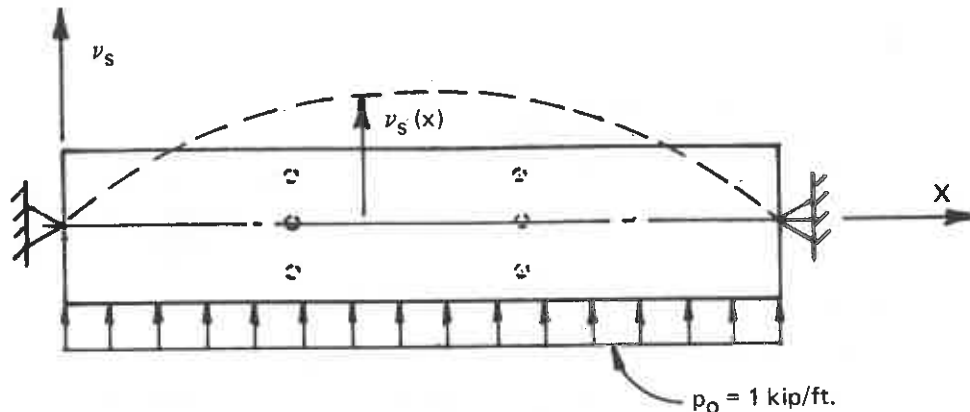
Plan view of three span bridge subjected to assumed transverse loading.
